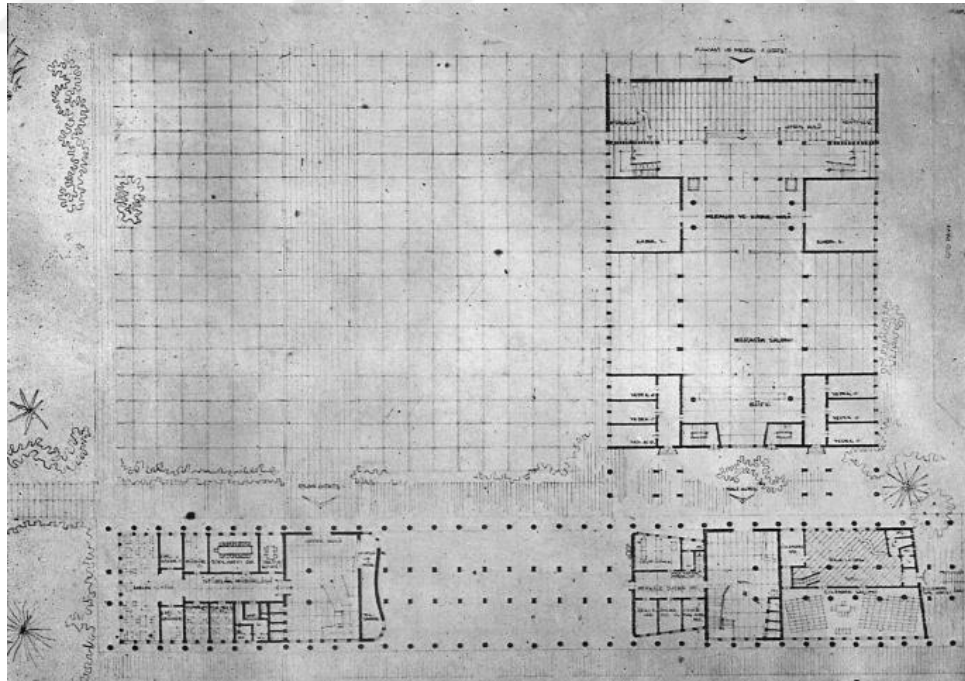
Ground floor plan of Nevzat Erol's project. In Anonim (1953).
